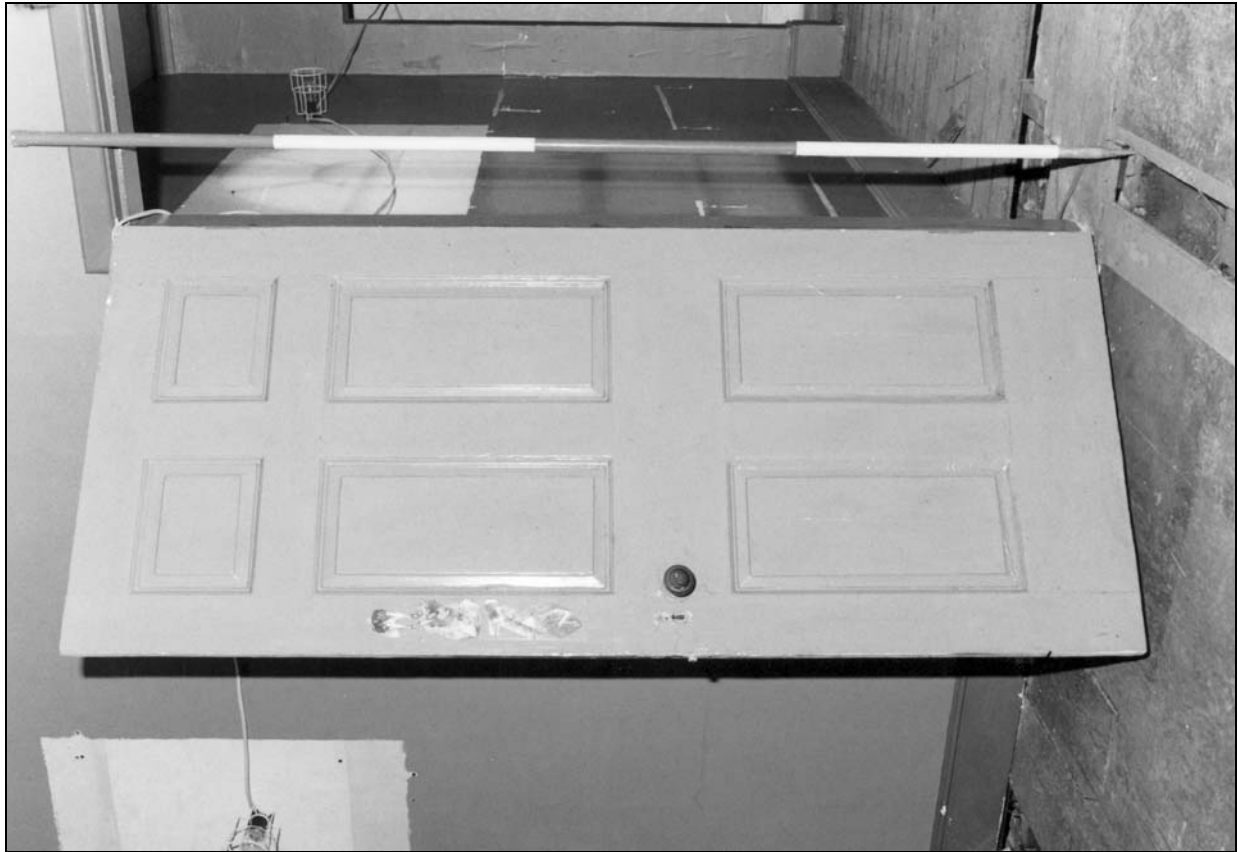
South wing: re-hung door to west first floor room F01 (film 4, frame 1)
